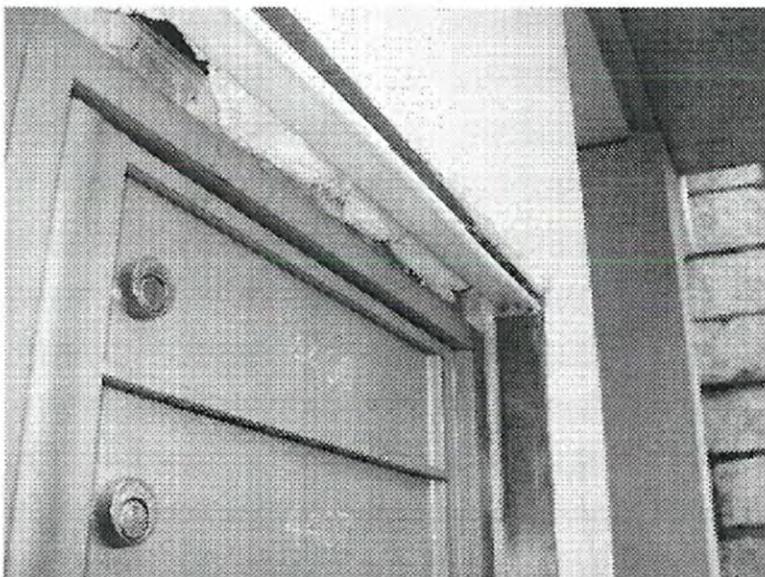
Lack of weather barrier tie-in at sheathing above mailboxes at Building C.
